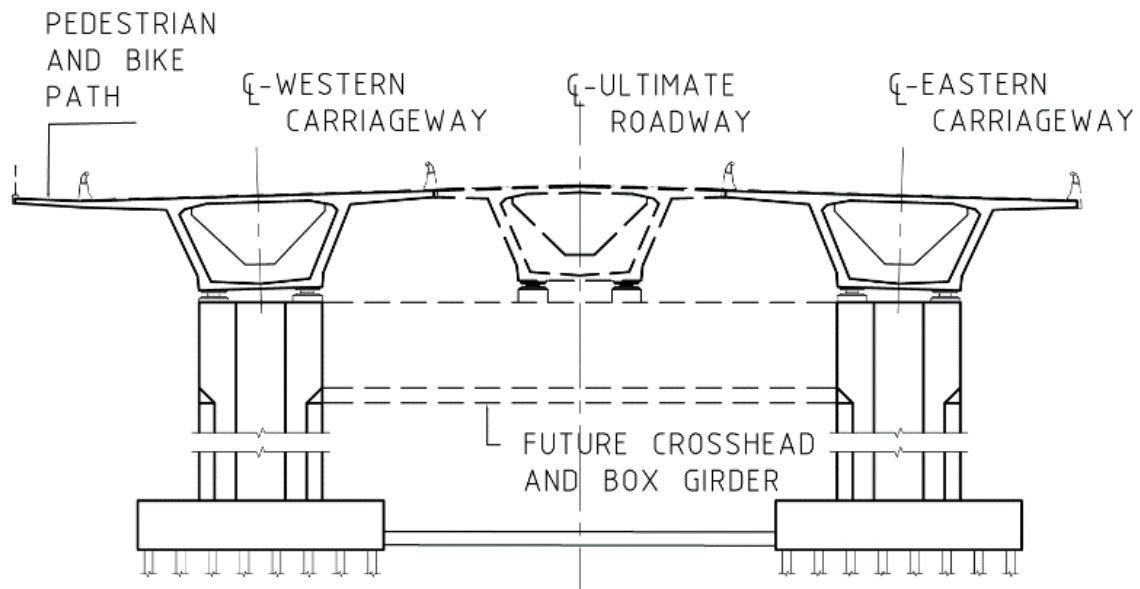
Image of the intended future widening concept (Noonan, 1994)
